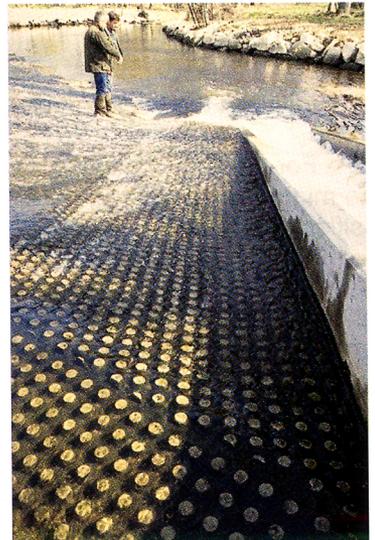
Concrete blocks on downstream weir face to make small eel passage easier (Tardoire river).
